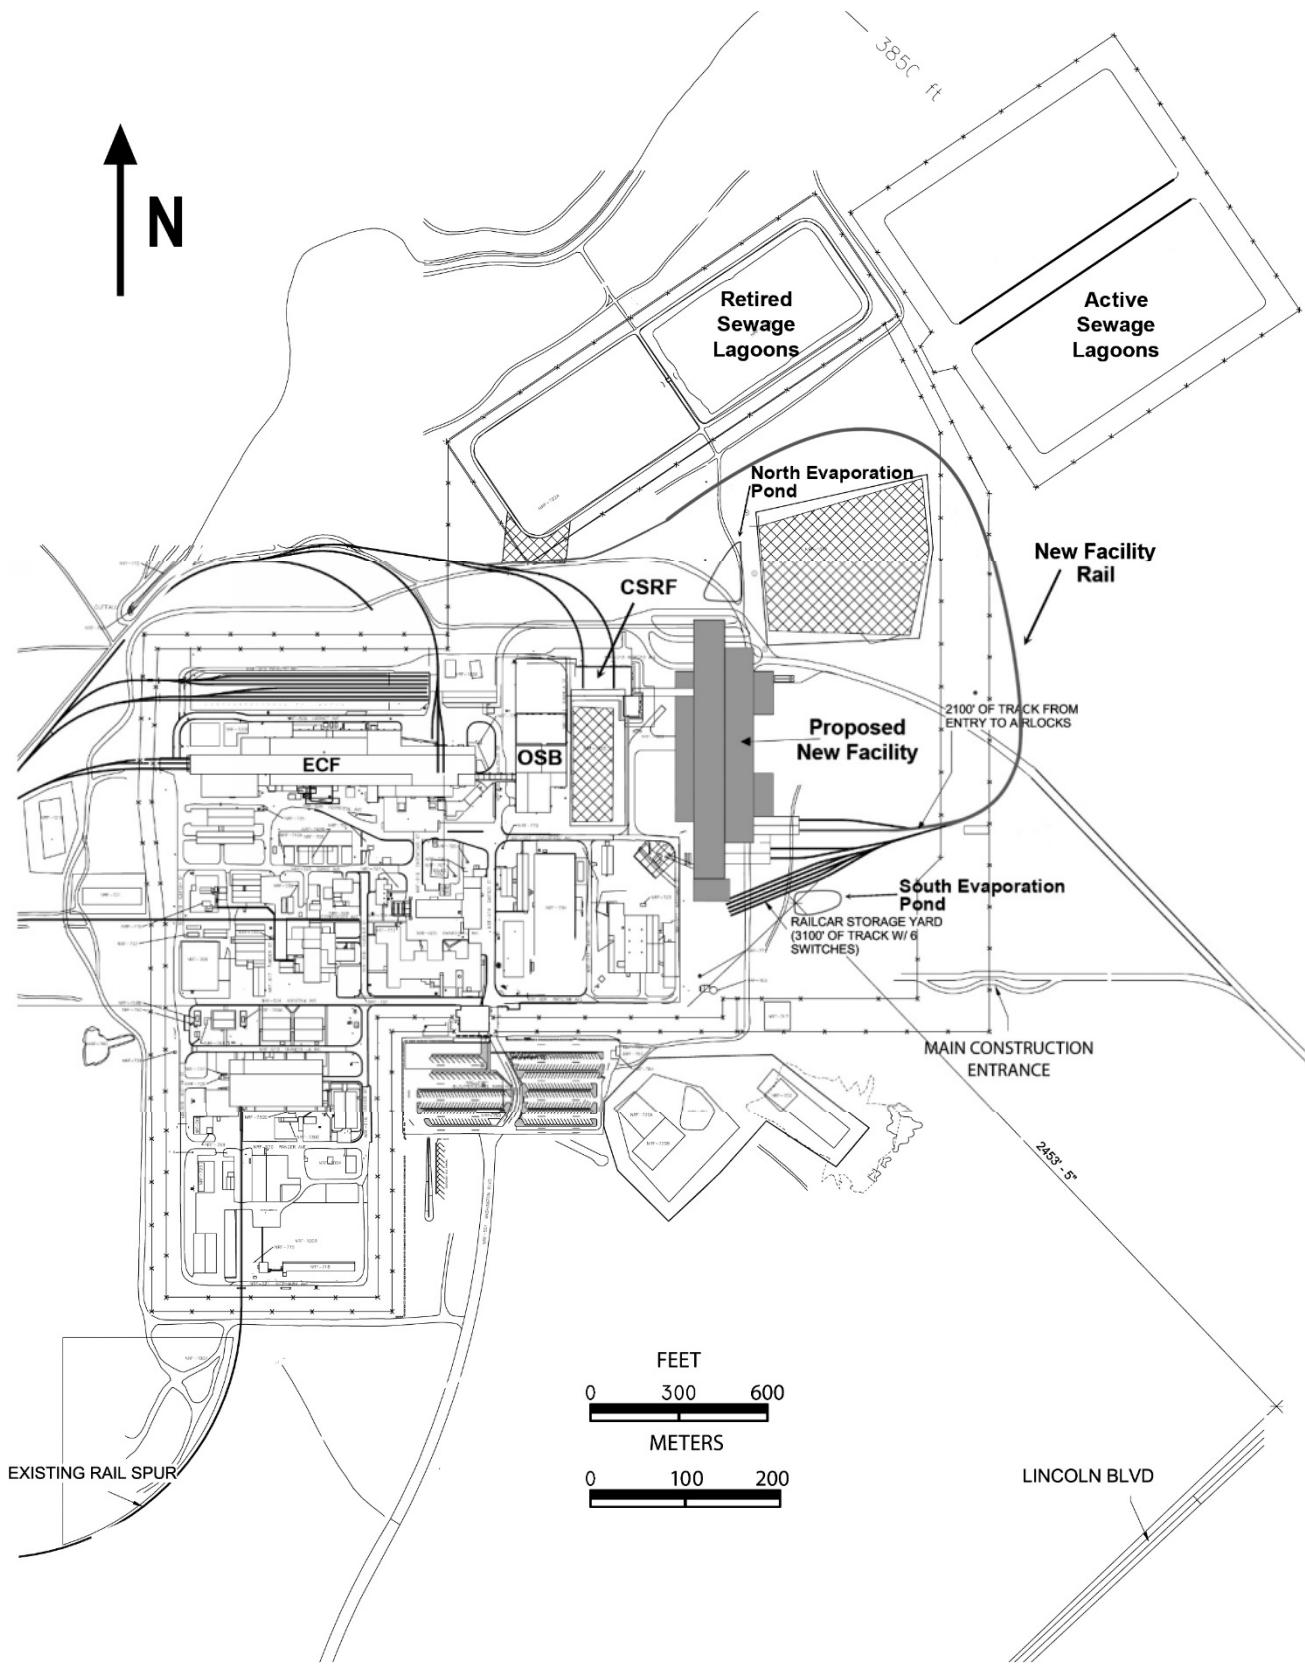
Conceptual Rail Line for the New Facility Alternative at Location 3/4
